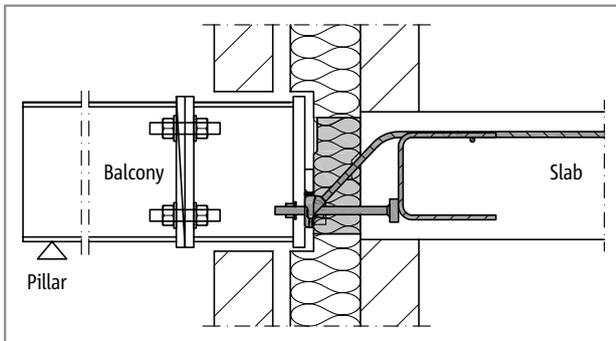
Schöck Isokorb® T type SQ: insulating element within the core insulation zone; steel stub adjuster between the Isokorb® and the balcony for flexible construction workflow
